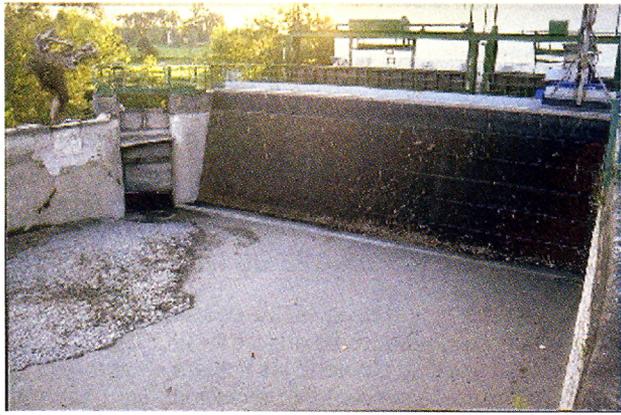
Downstream surface bypass at the Soieux power station intake (Gave d'Aspe river, Pyrenees).
